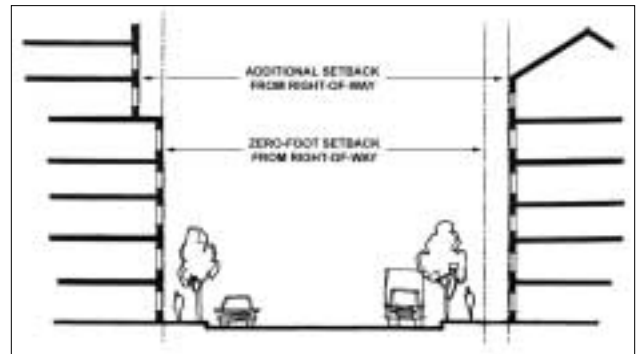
To reduce the impact of tall buildings along pedestrian-oriented streets, either the portion of the building that is higher than 60 feet or the building itself must be set back from the street right-of-way.
